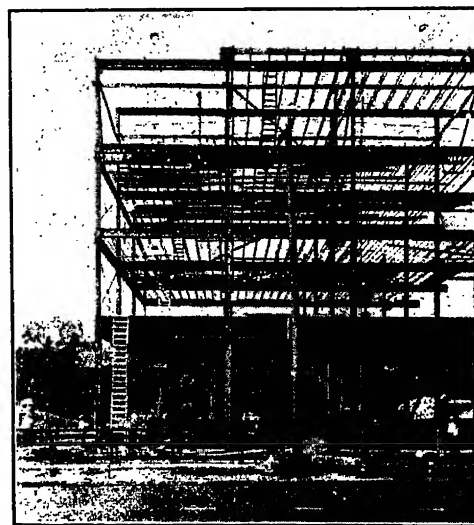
CLEVELAND OFFICE BUILDING. ILLUSTRATES DECREASE IN WEIGHT OF COLUMNS FROM THE FIRST FLOOR TO THE FOURTH FLOOR
